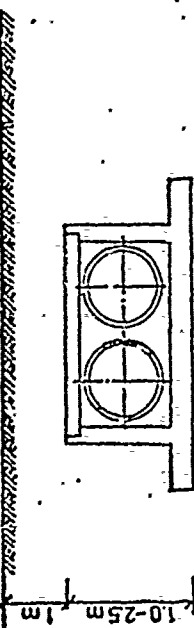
Typical conventional pipe in culvert heat transmission system. The culvert has drain pipes on the outside at its base for ground water control.
